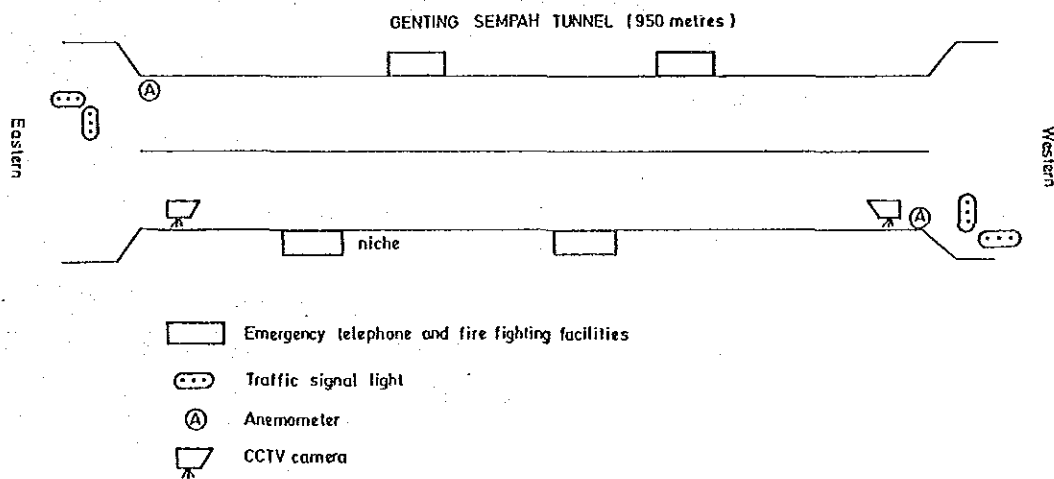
Layout of Main Equipment in Genting Sempah Tunnel
